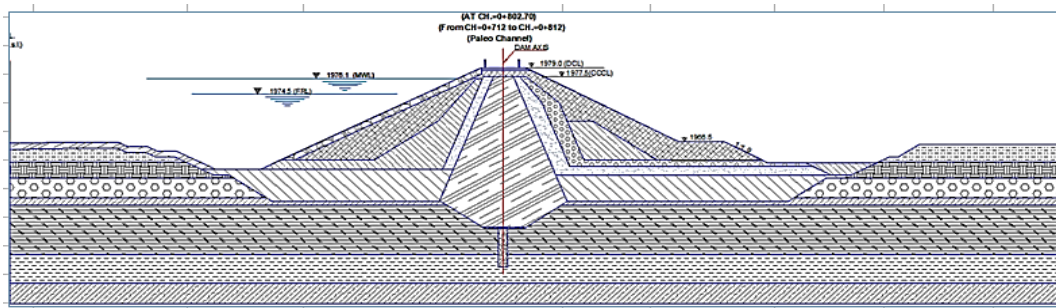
43 Final Drawing for Measurement for pricing for BH-7
